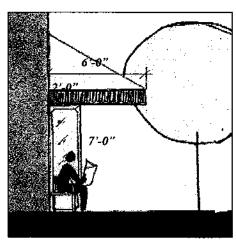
(E): Examples of Encroachments into the sidewalk.
